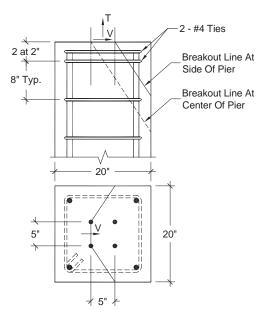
Pier for Ex. 9.4.2 Showing Shear Breakout Cone
